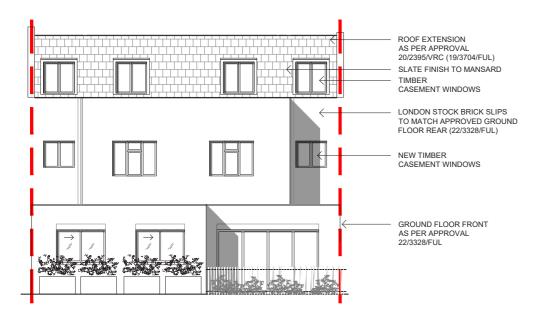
Approved rear elevation ref. 23/1819/FUL
